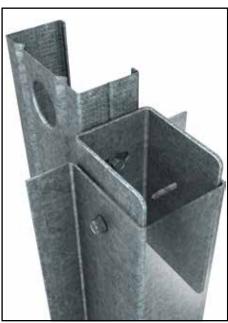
VERTICAL FIXING TO STEEL STUD
